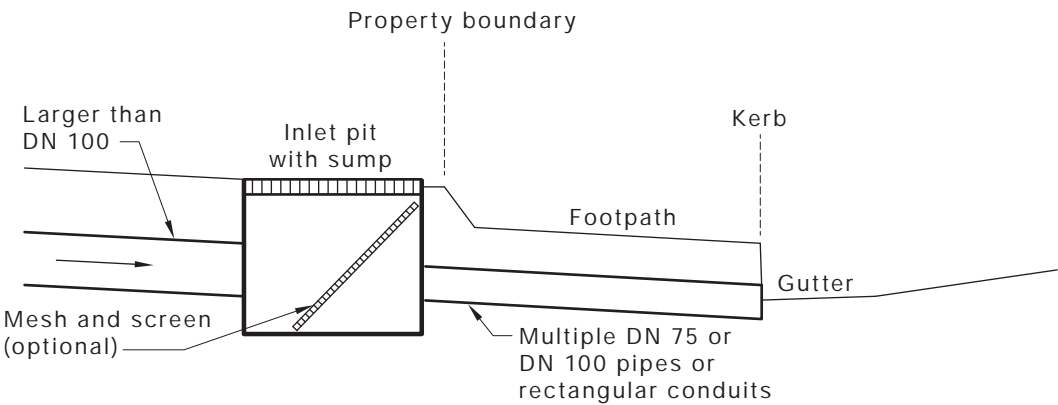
TYPICAL ARRANGEMENT OF INLET PIT AND FOOTPATH CROSSING
